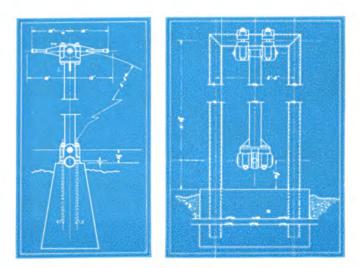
Blue print cross section of Lufkin hold-up and hold-down illustrated to the right
